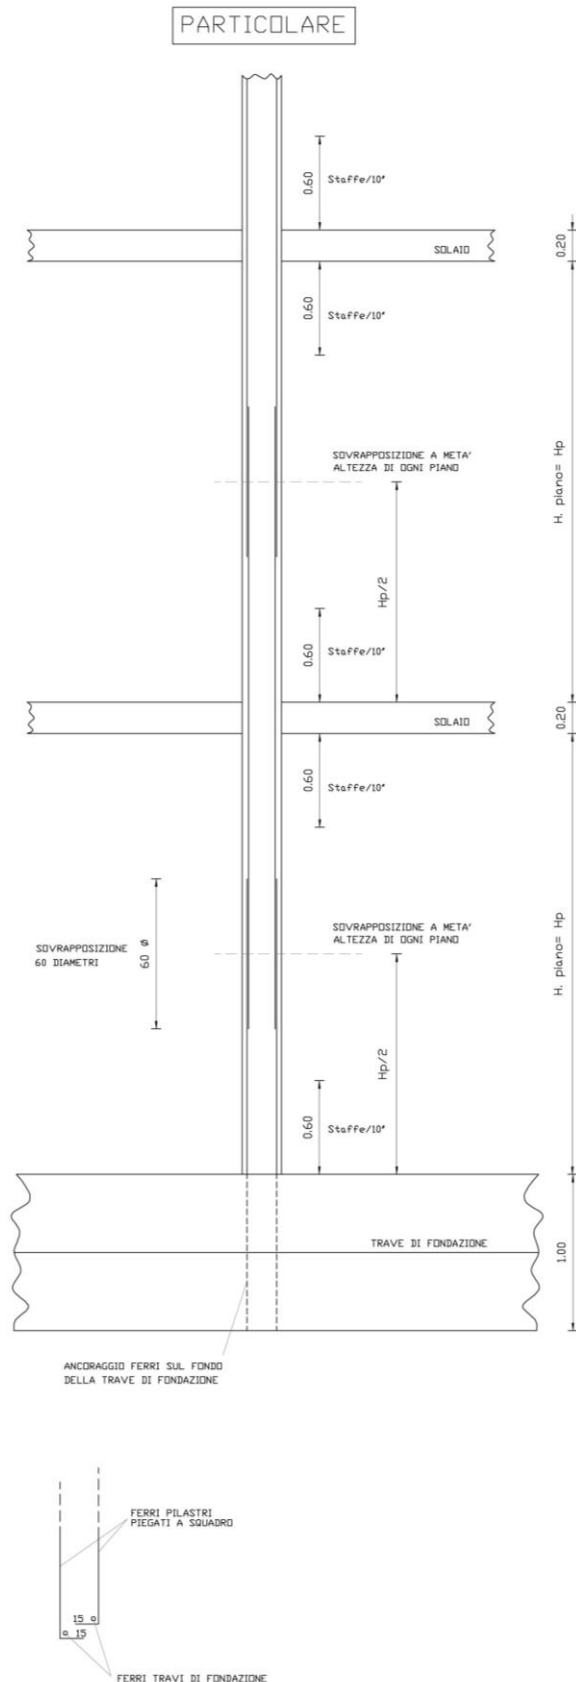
Technical drawings of the details of the RC columns – Source: [151]
